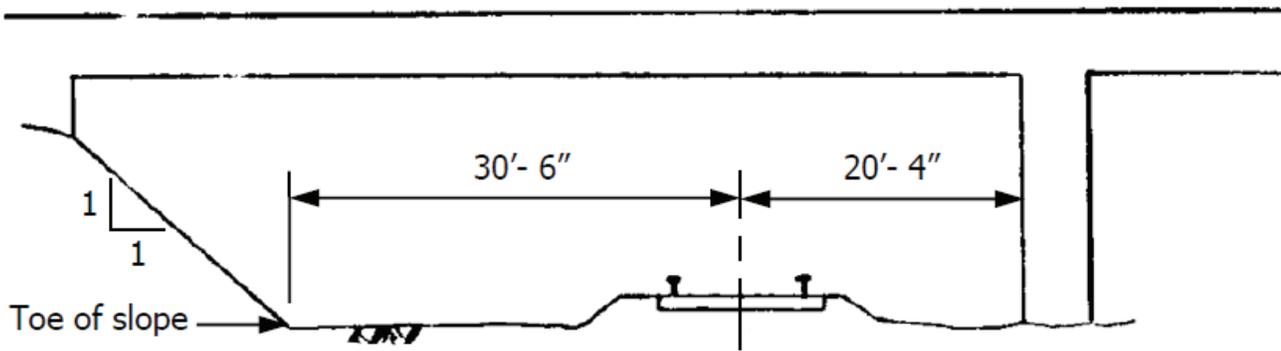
Bridge elevation view indicating horizontal offset for one railroad track below the bridge.
